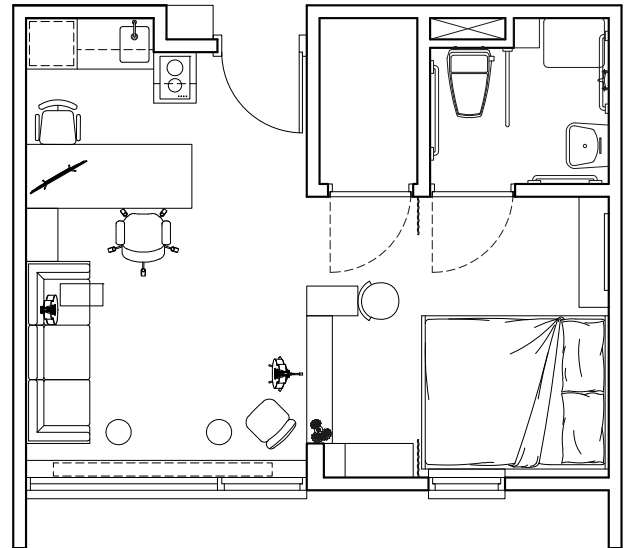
Floor plan of the room #04 (illustrated by author)
